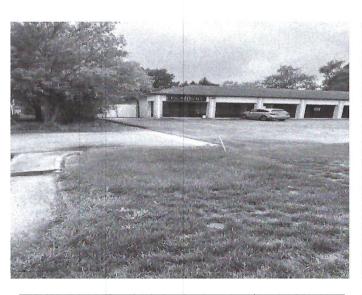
Looking south at existing asphalt pavement. Pavement appears to be in good condition with sign of deterioration or exposed soil.
